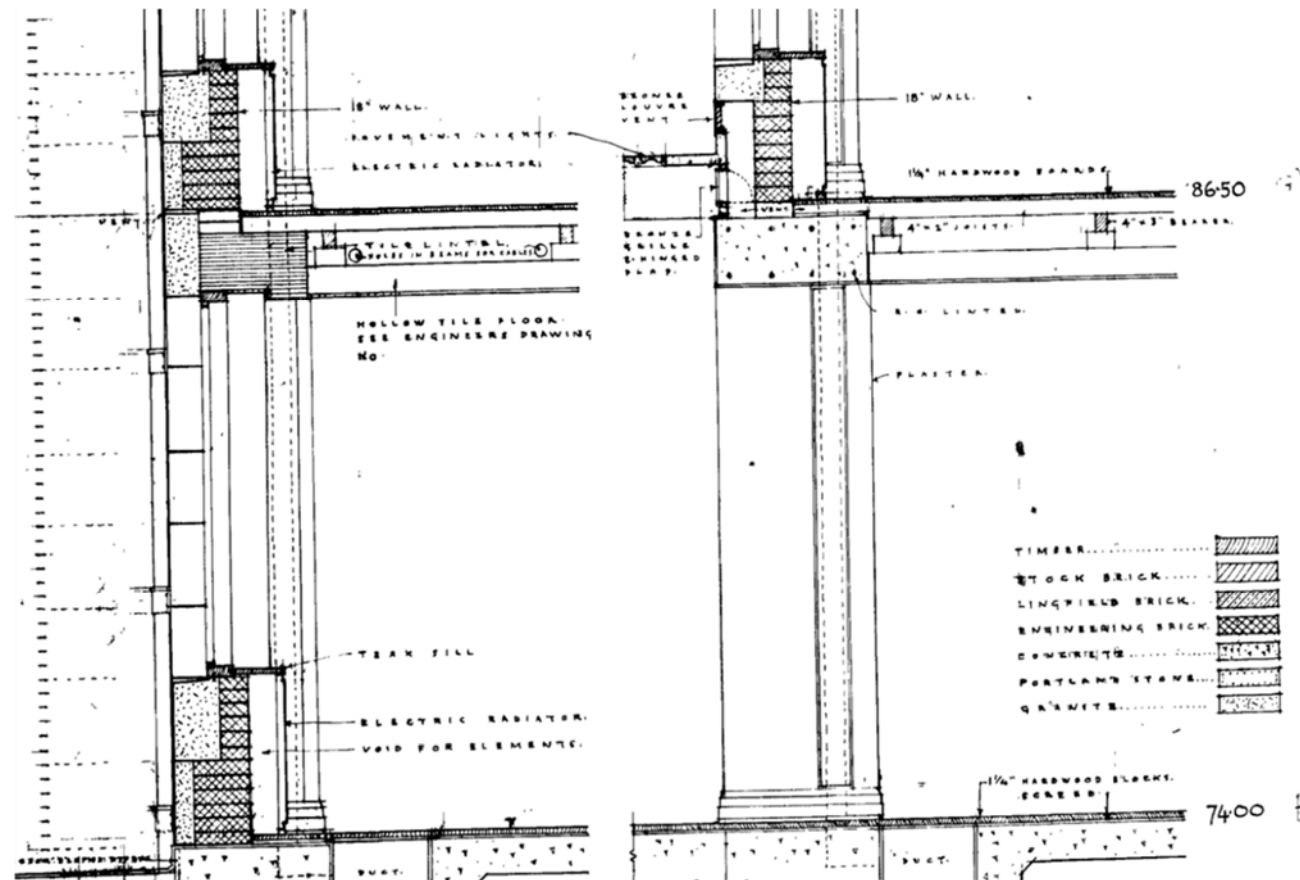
A section drawing showing the design of the duct and voids running beneath floor and along the window frames. Source: University of London.
